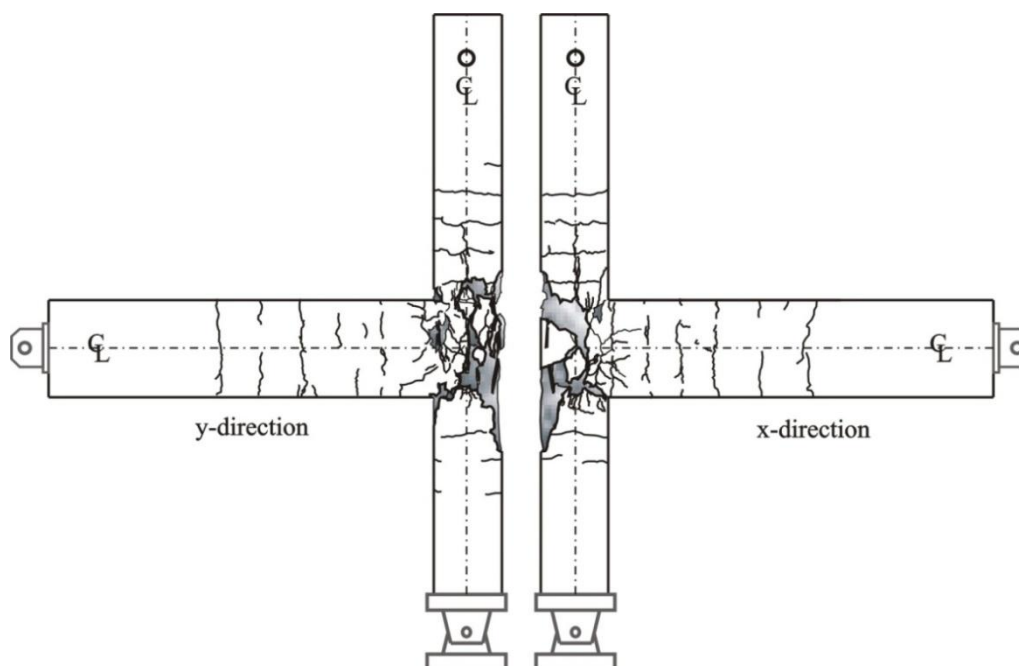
Crack patterns at final stage for Specimen 3D1
